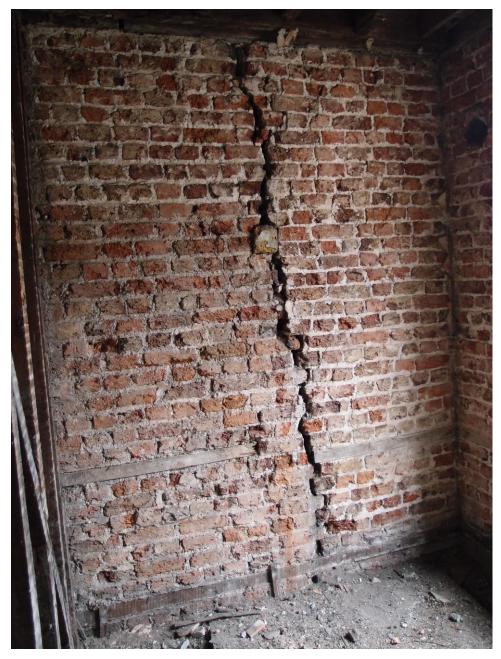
Internal brickwork second floor crack at partition wall
